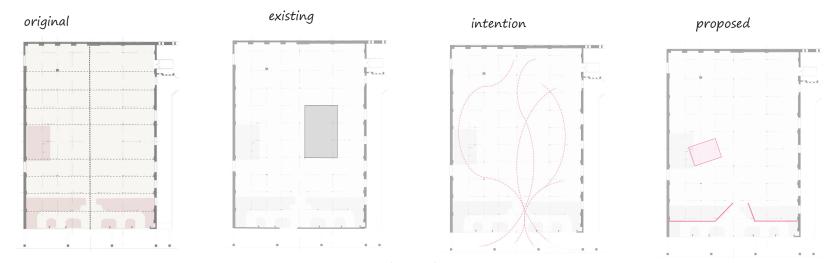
Development of the ground floor plan illustrating inspiration from the original layout of the Saxon Building (Author, 2013)
